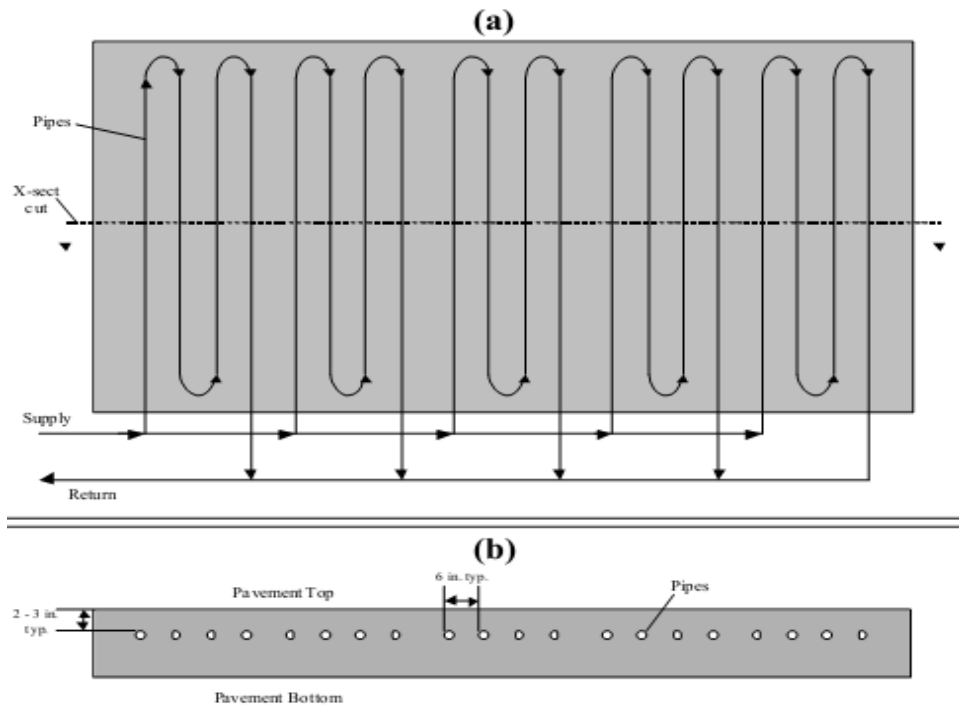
Typical hydronic loop layout of a geothermally heated bridge deck/pavement: (a) plan view, (b) cross-sectional view (Chiasson and Spitler 2001b)
